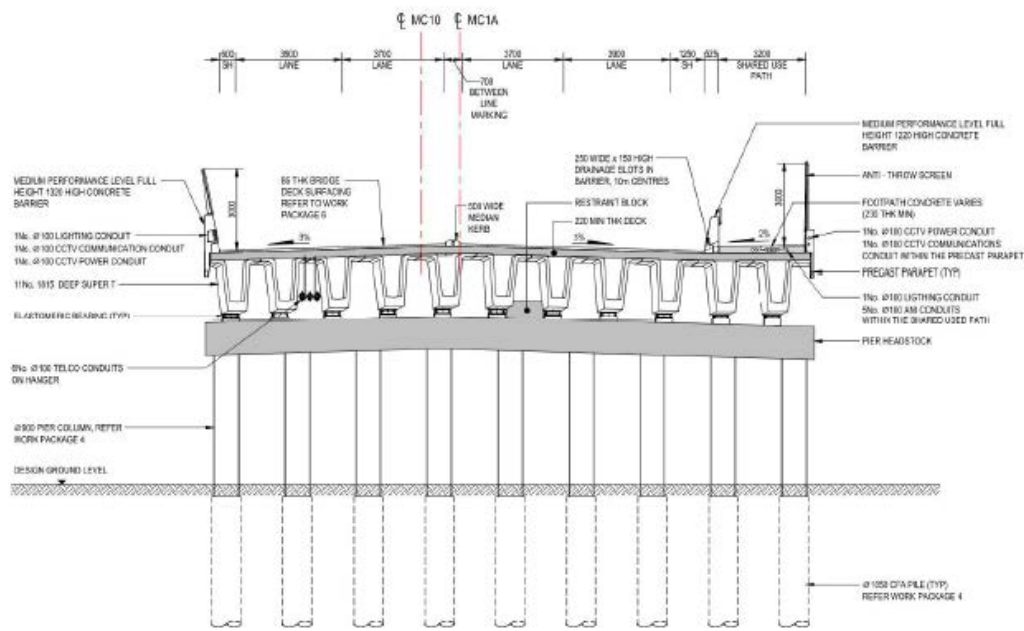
Pier 2, 3, 6, 7, and 8 typical cross section
